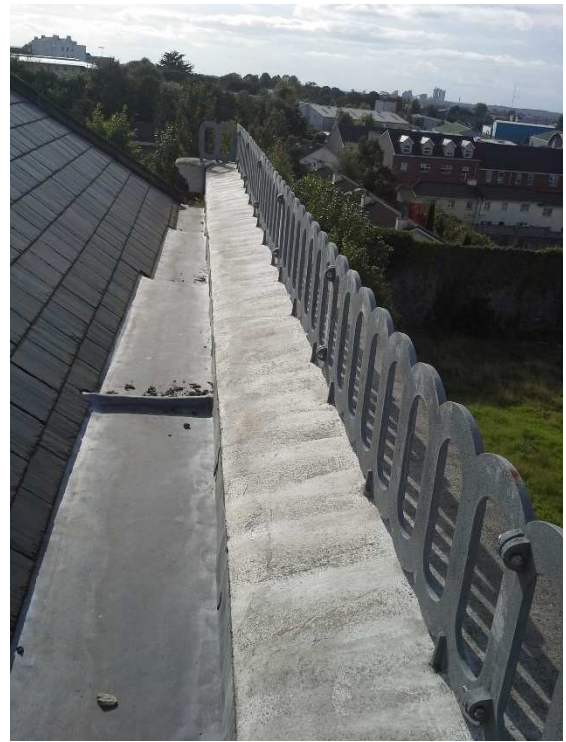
Photos showing repairs to cantilevered parapet sections at rear of building along with new render to tops of parapet walls and the refitted repaired and painted cast iron railing.
